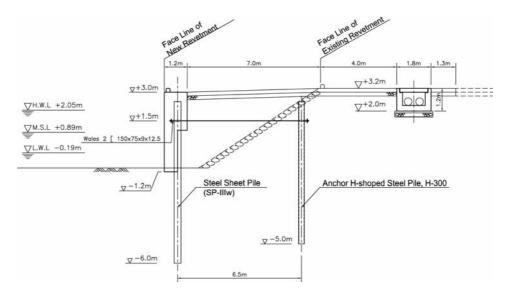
Typical Cross Section of East Mole Revetment
